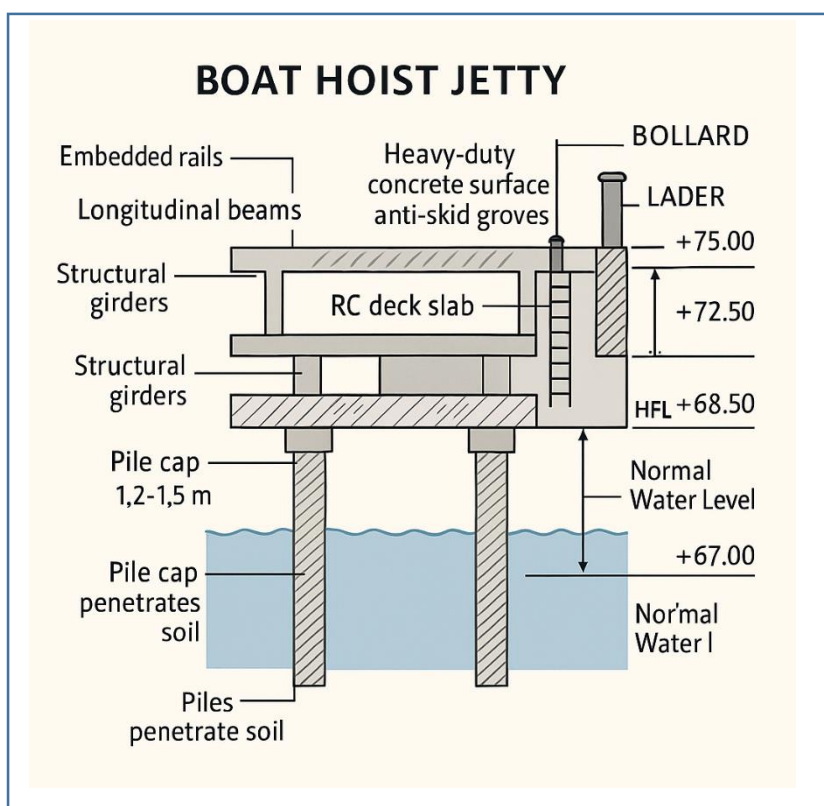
9 Typical Cross section of Boat Hoist Jetty Loadings for Ship repair facilities
